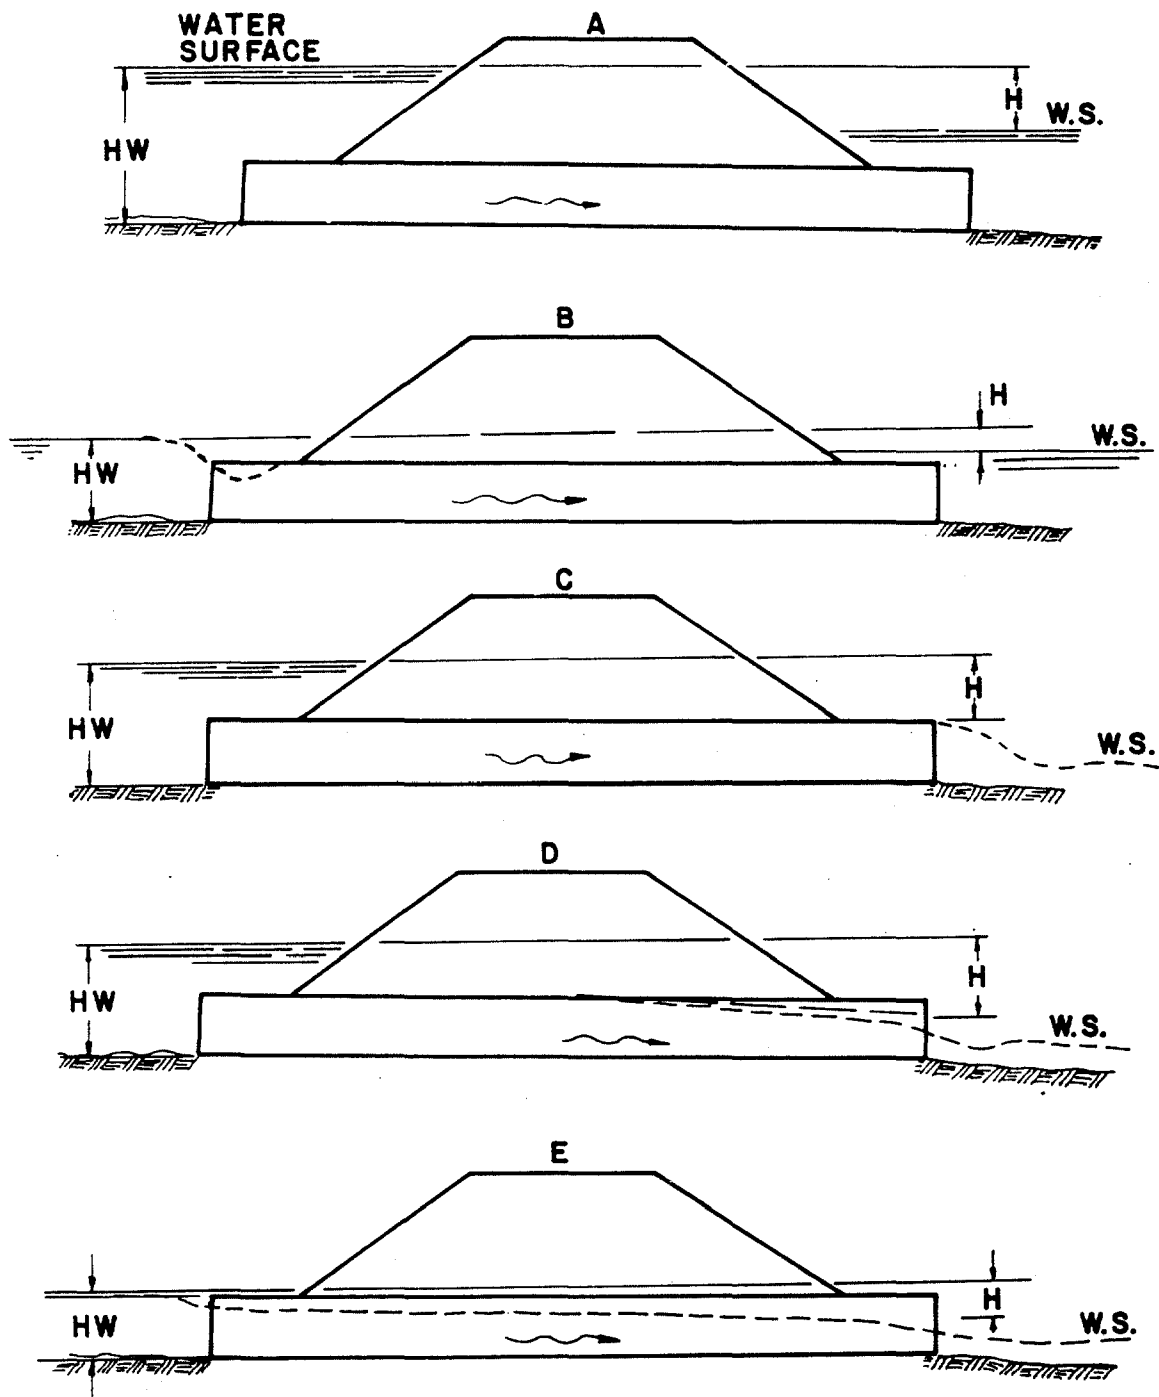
Typical culvert section under outlet control.⁽¹¹⁾
